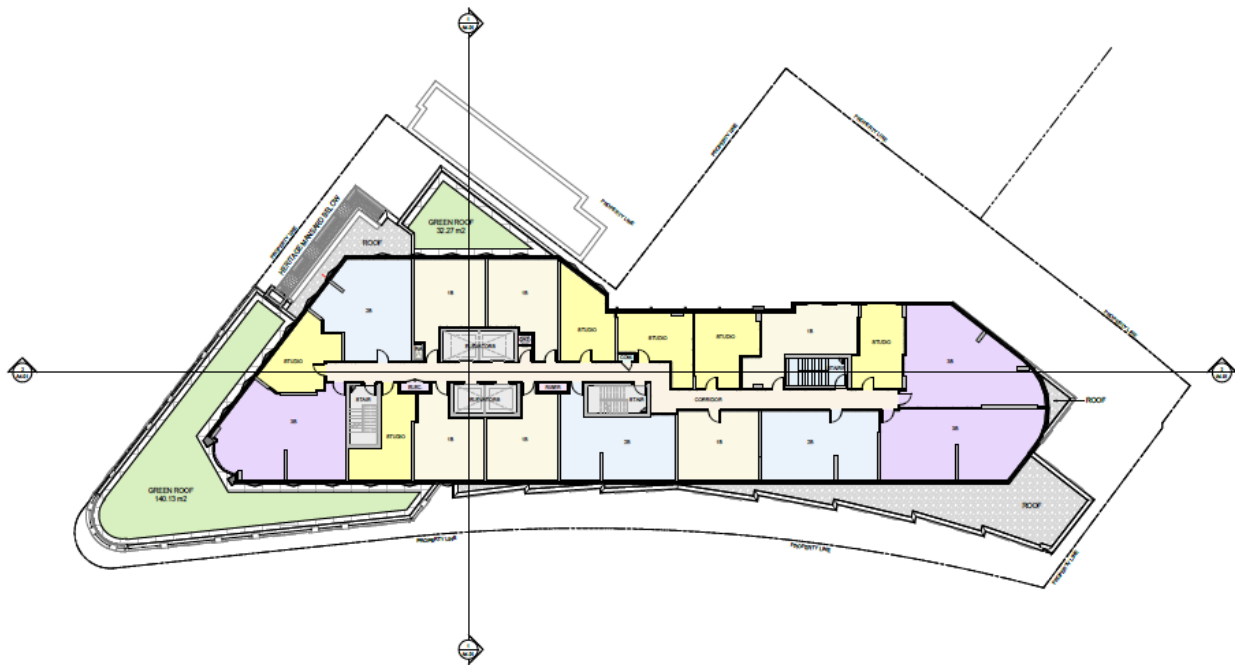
Level 5 floor plan for 212 Dundas Street East included for illustration purposes (Rafael & Bigauskas Architects Inc., February 23, 2026).
